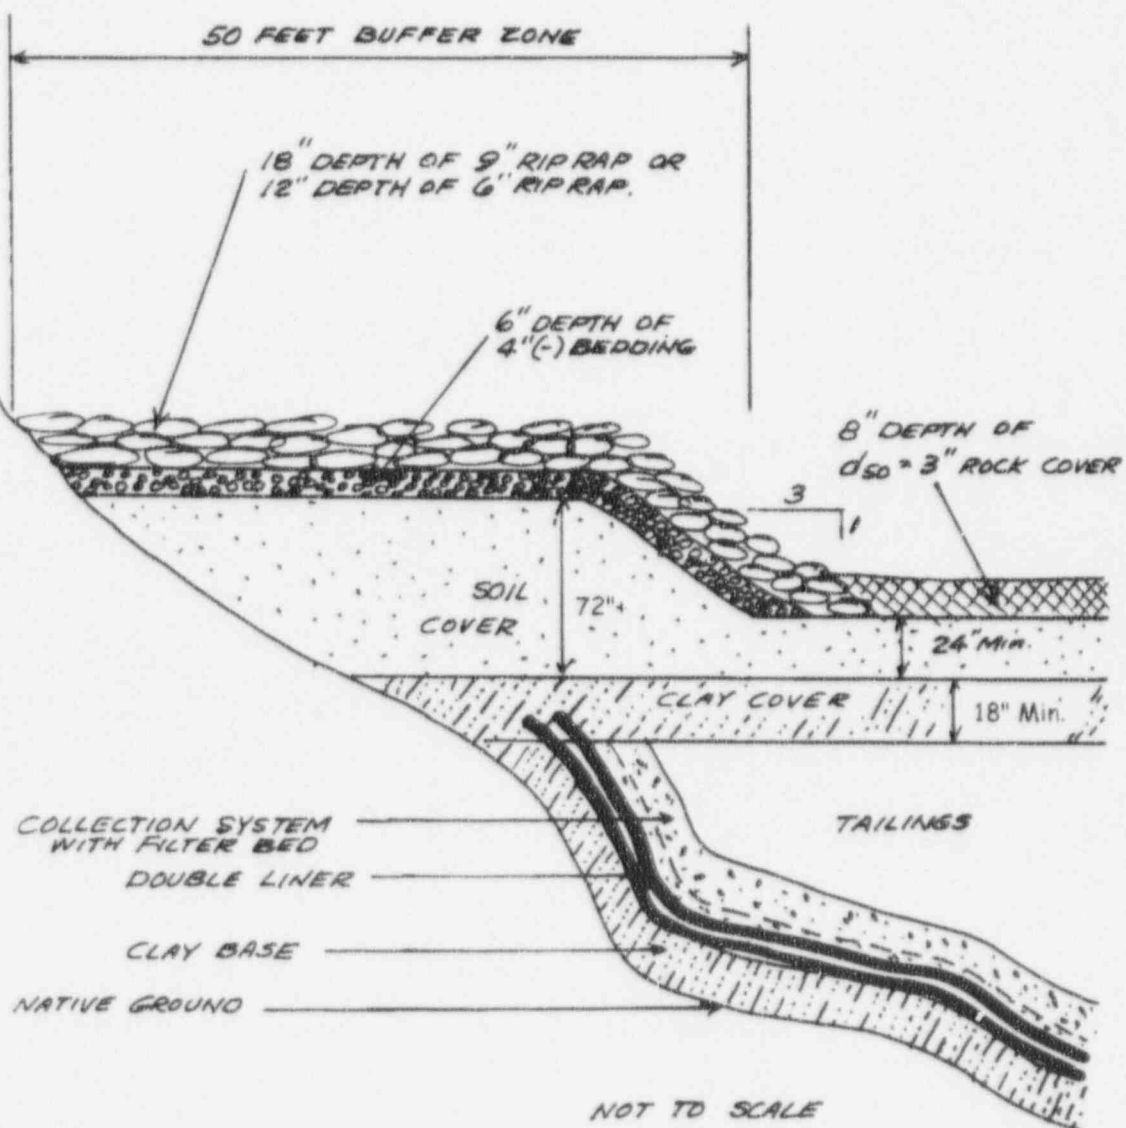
Section (F-F') Typical section of buffer zone on west side of impoundment.
